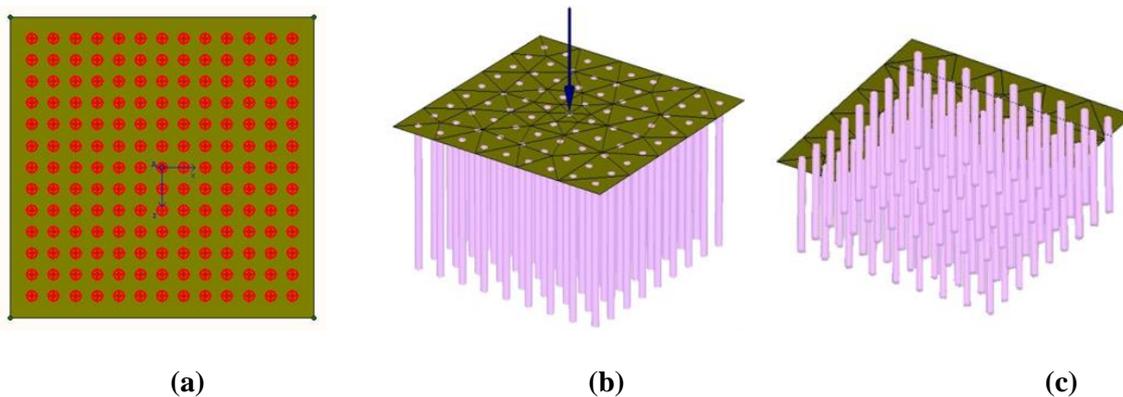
Model of Short Piled Raft foundation system with 7.0 m x 7.0 m concrete slab, (a) plan with pile spacing of 0.50 m; (b) & (c) upper & bottom view with pile spacing of 0.75 m.
